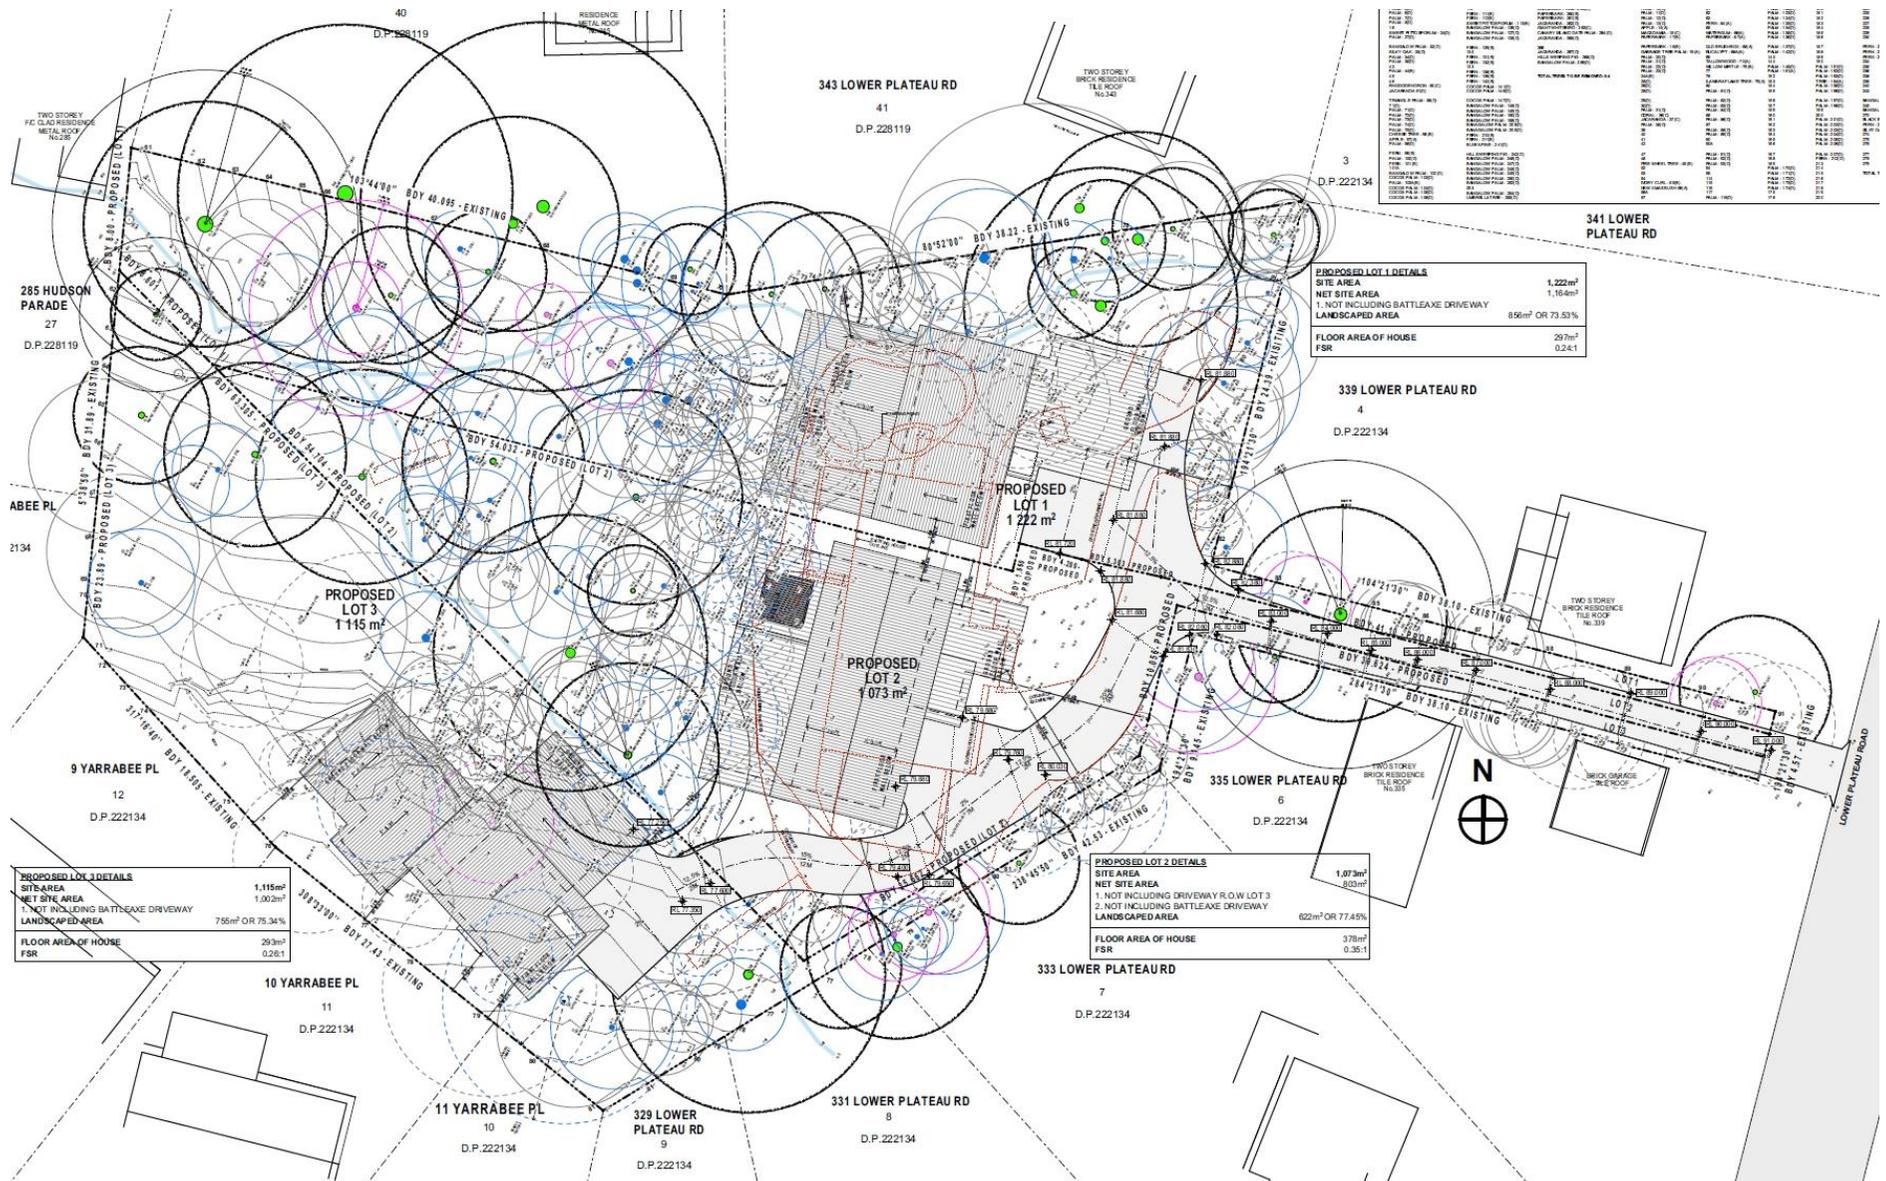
Site Plan. Source: Proposed Subdivision. Gartner Trovato. 30/08/2022.
